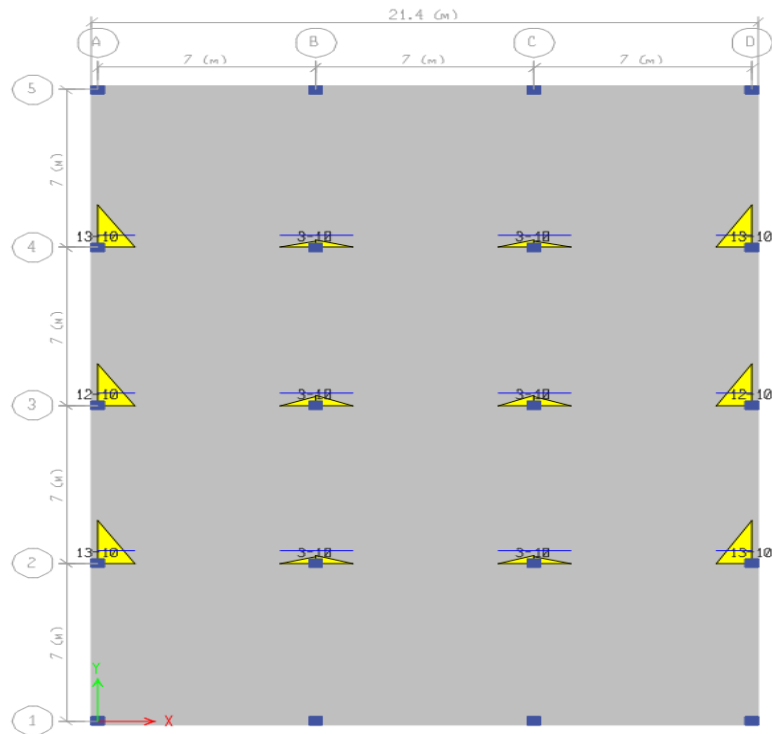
PT flat slab Top reinforcement layout in layer A strip direction
